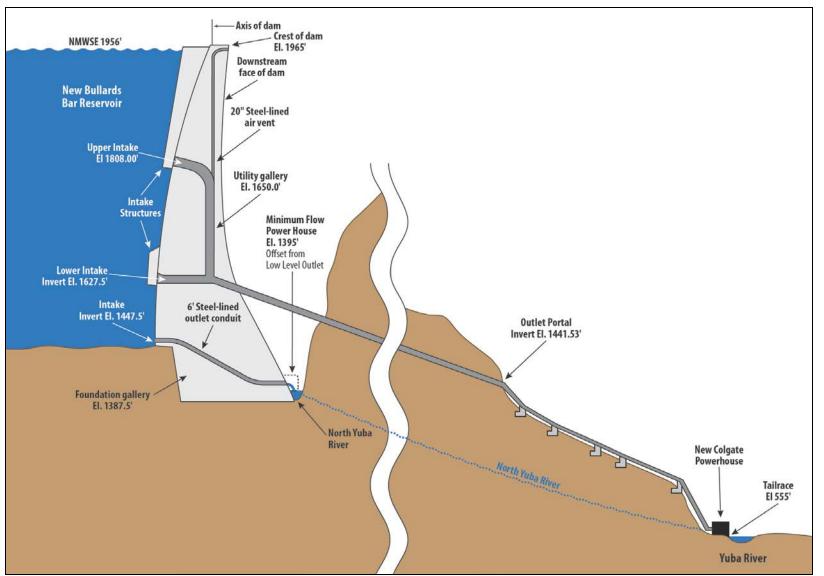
Longitudinal schematic of New Bullards Bar Dam on the North Yuba River and New Colgate Power Tunnel and Powerhouse on the Yuba River.
